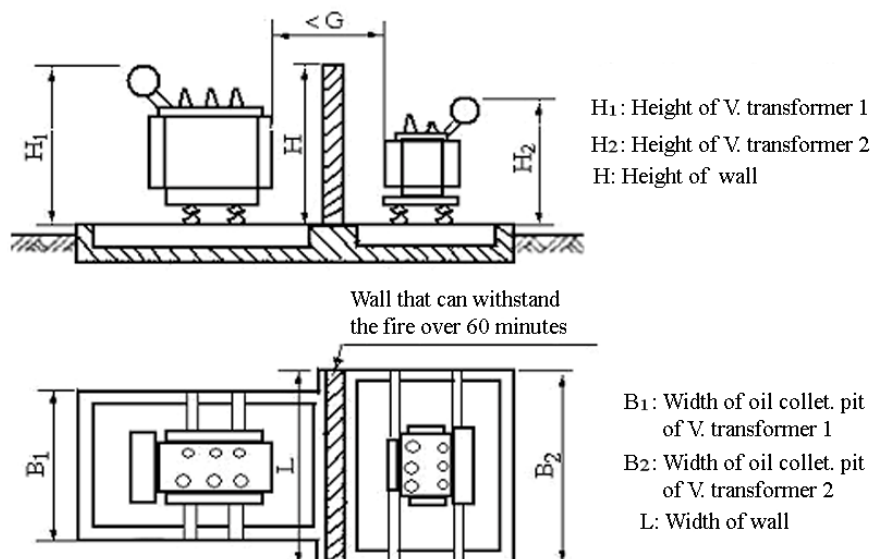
a: The wall between voltage transformers, placed outdoor
